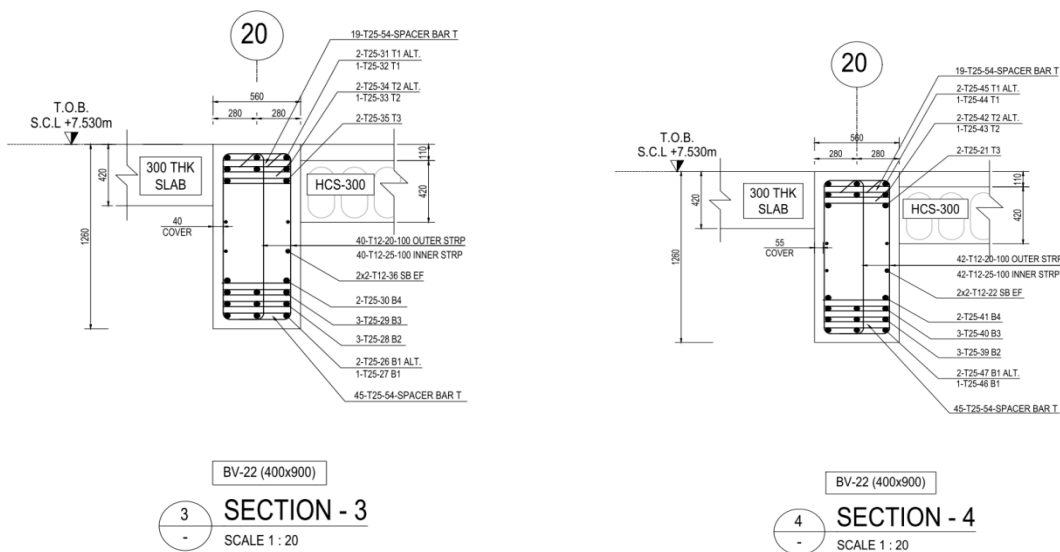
Cross-Sectional Details (Section 3, 4) of Beam showing Reinforcement Layers
